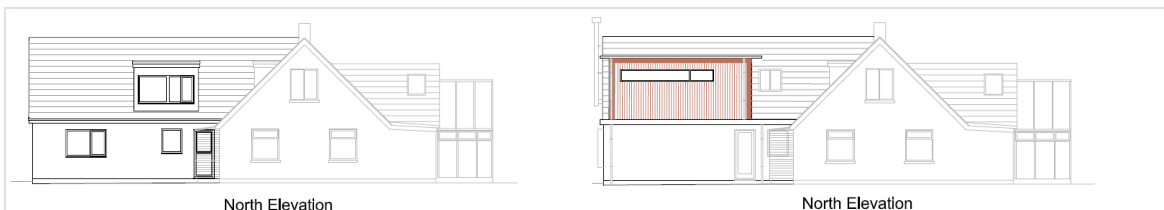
Existing and Proposed North side elevation (facing Broomfields)
